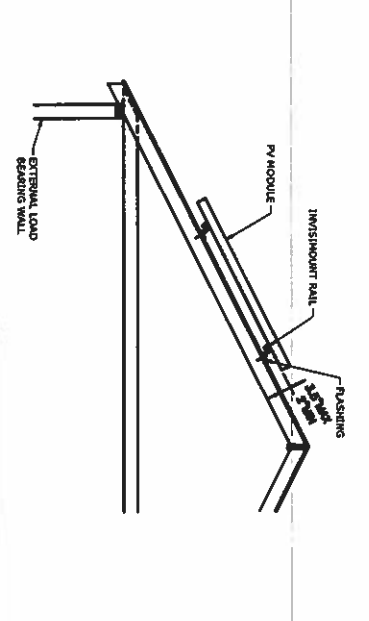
ROOF 2A STRUCTURAL FRAMING DETAIL
